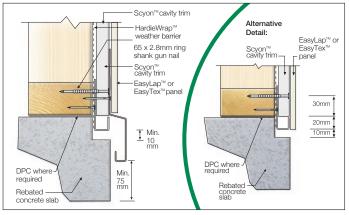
ALTERNATIVE SLAB EDGE DETAILS
